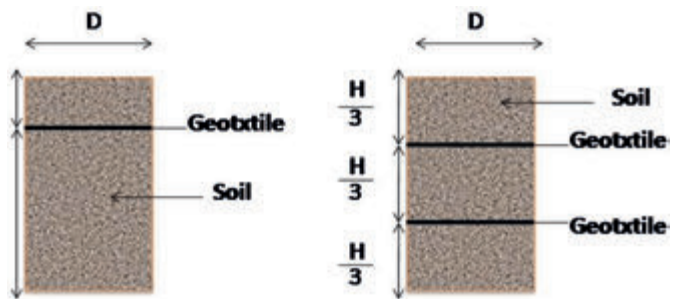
Single and Multi-Layer Geotextile Reinforcement Configurations in Soil Blocks
